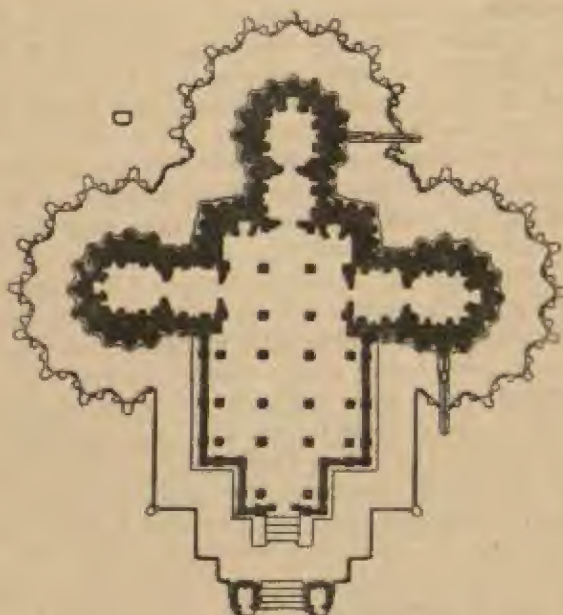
STAR-SHAPED TEMPLE PLAN.
